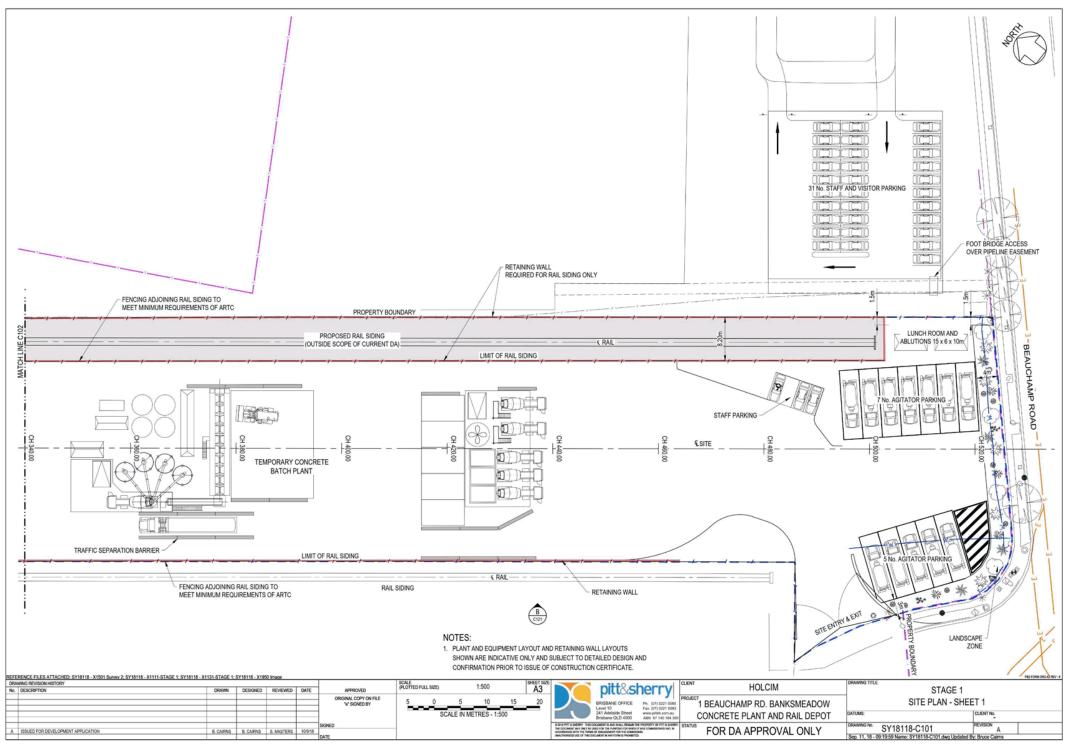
Stage 1 Concept Layout – Sheet 1 (Subject to Detailed Design)
